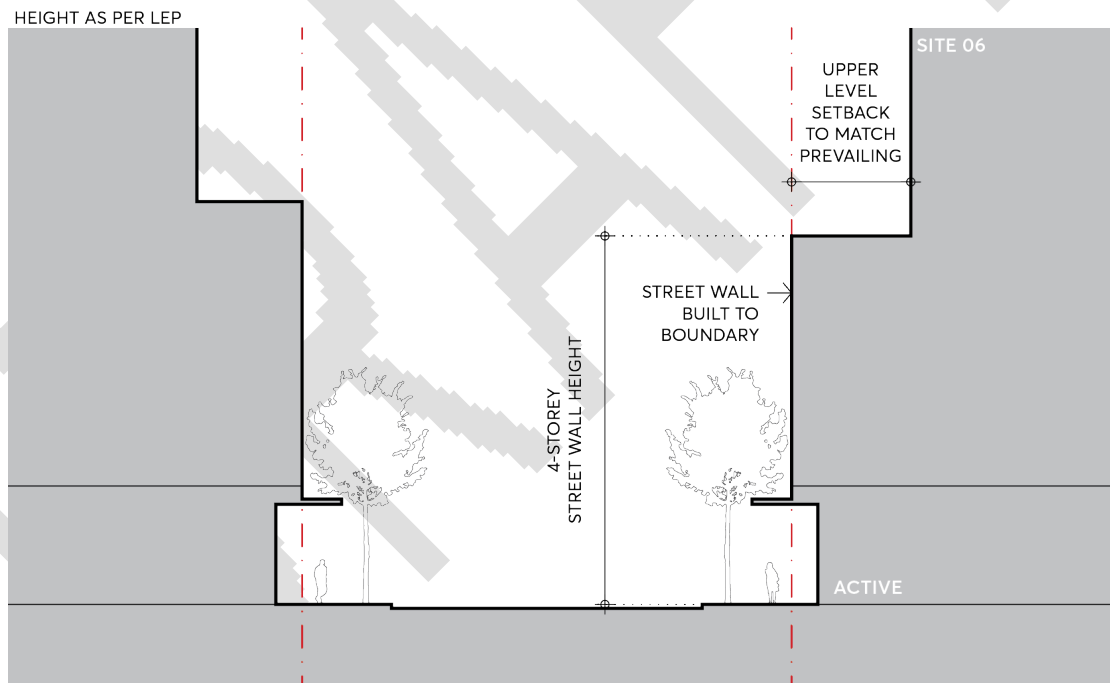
Cowper Street (Section C) Setbacks and Street Wall Height
